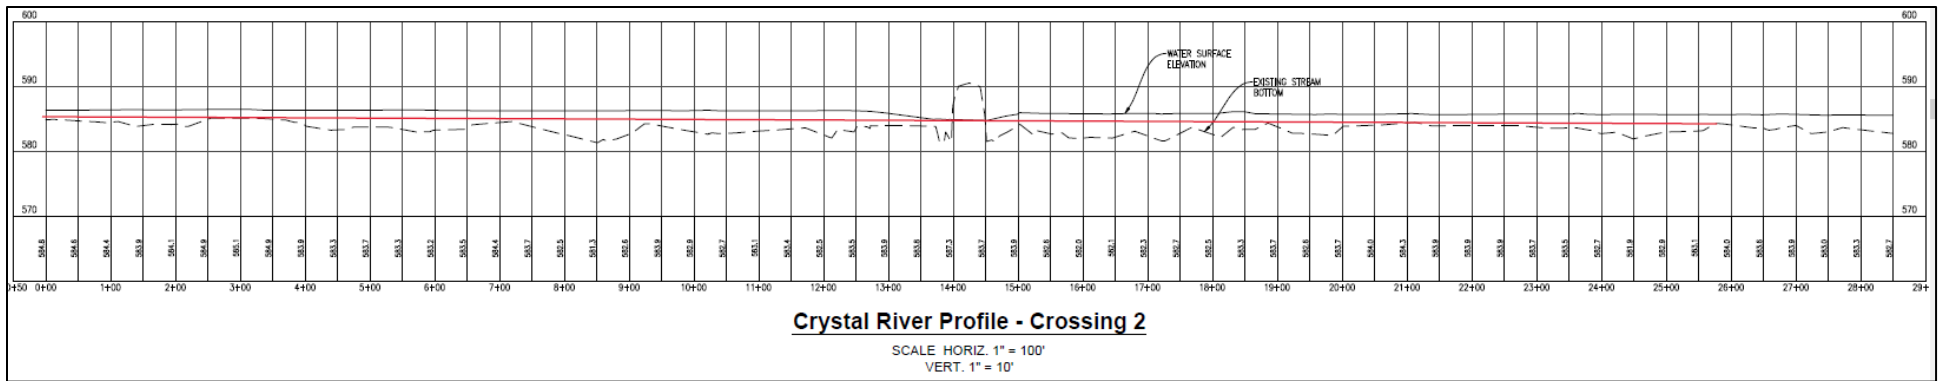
Crystal River Profile, Crossing #2. Dashed line shows existing stream bottom, single dark line shows water surface elevation and red line illustrates the continuity of streambed elevations from downstream to upstream of the crossing.
